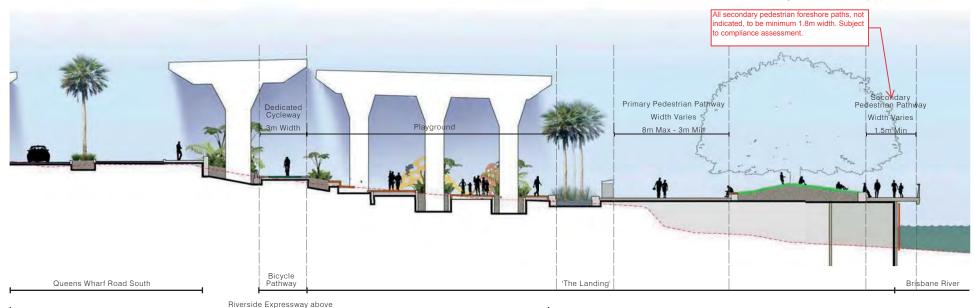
The Landing Typical Sectional Elevation (Not to scale)
